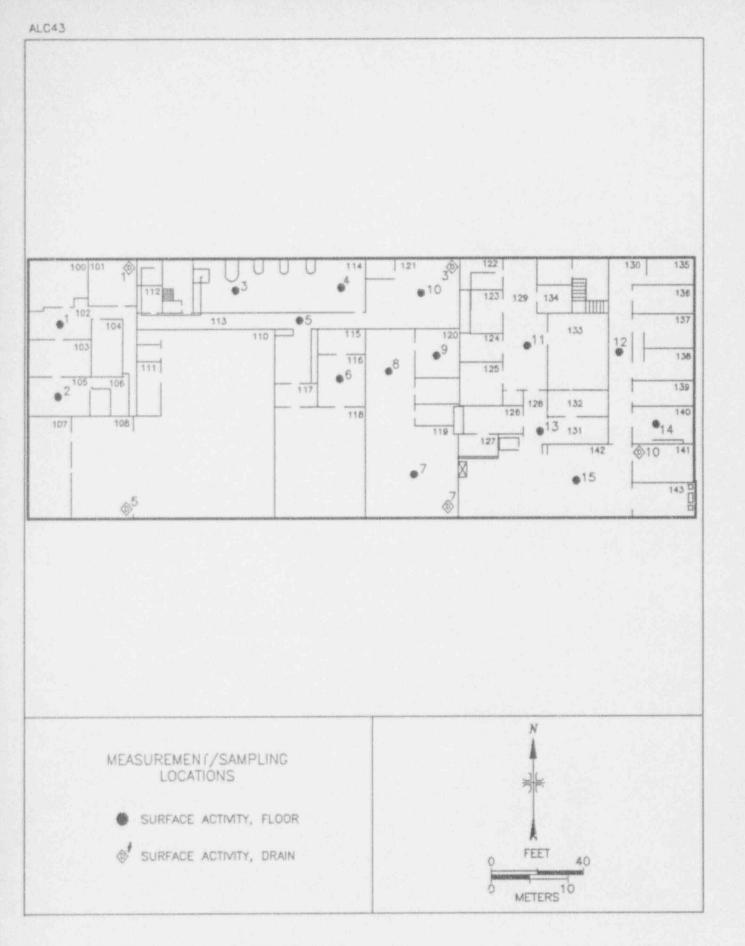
Building 65, First Floor - Measurement and Sampling Locations
